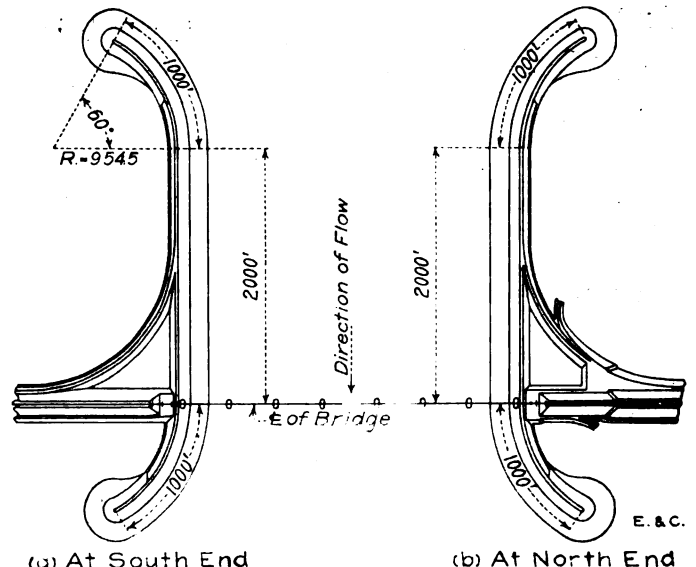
Plans of Protection Works at North and South Ends of Lower Ganges Bridge—Note Approaches to Protection Works.
